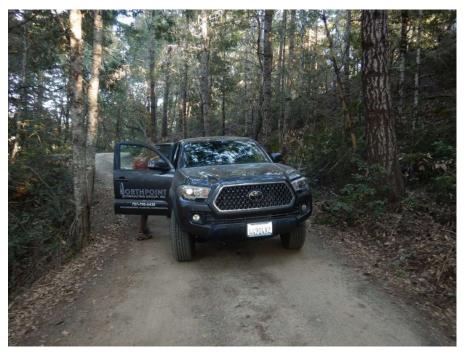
RP 12. Pinch Point, turnout at each side, 14.5-ft wide. Vehicle traveling west. Photo taken facing east. (40.086827°, -123.782276°)
